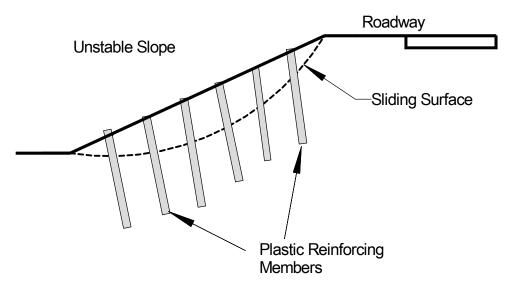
Stabilization of surficial slope failures with recycled plastic reinforcement.
